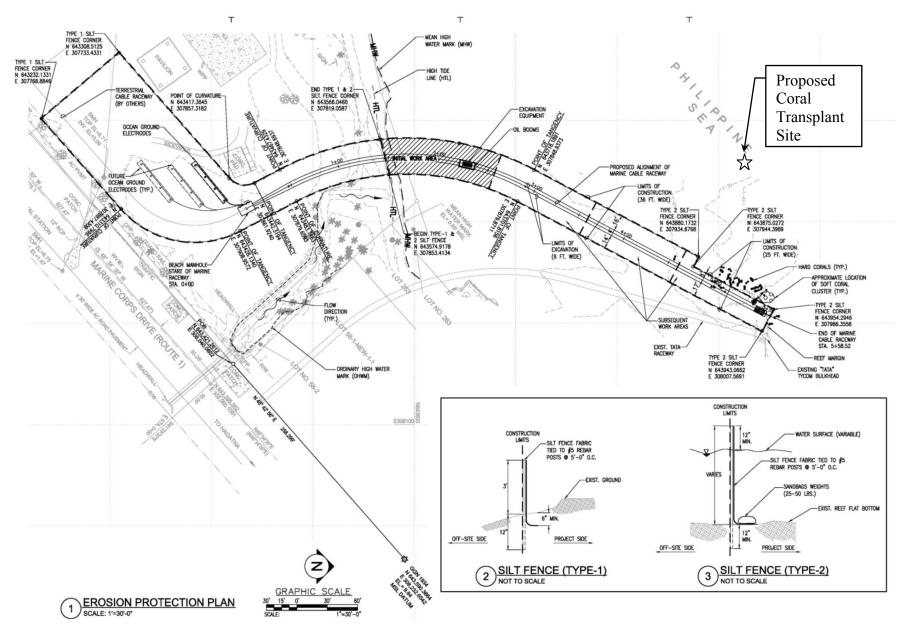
Plan view of GTA cable raceway showing proposed coral transplant site.
